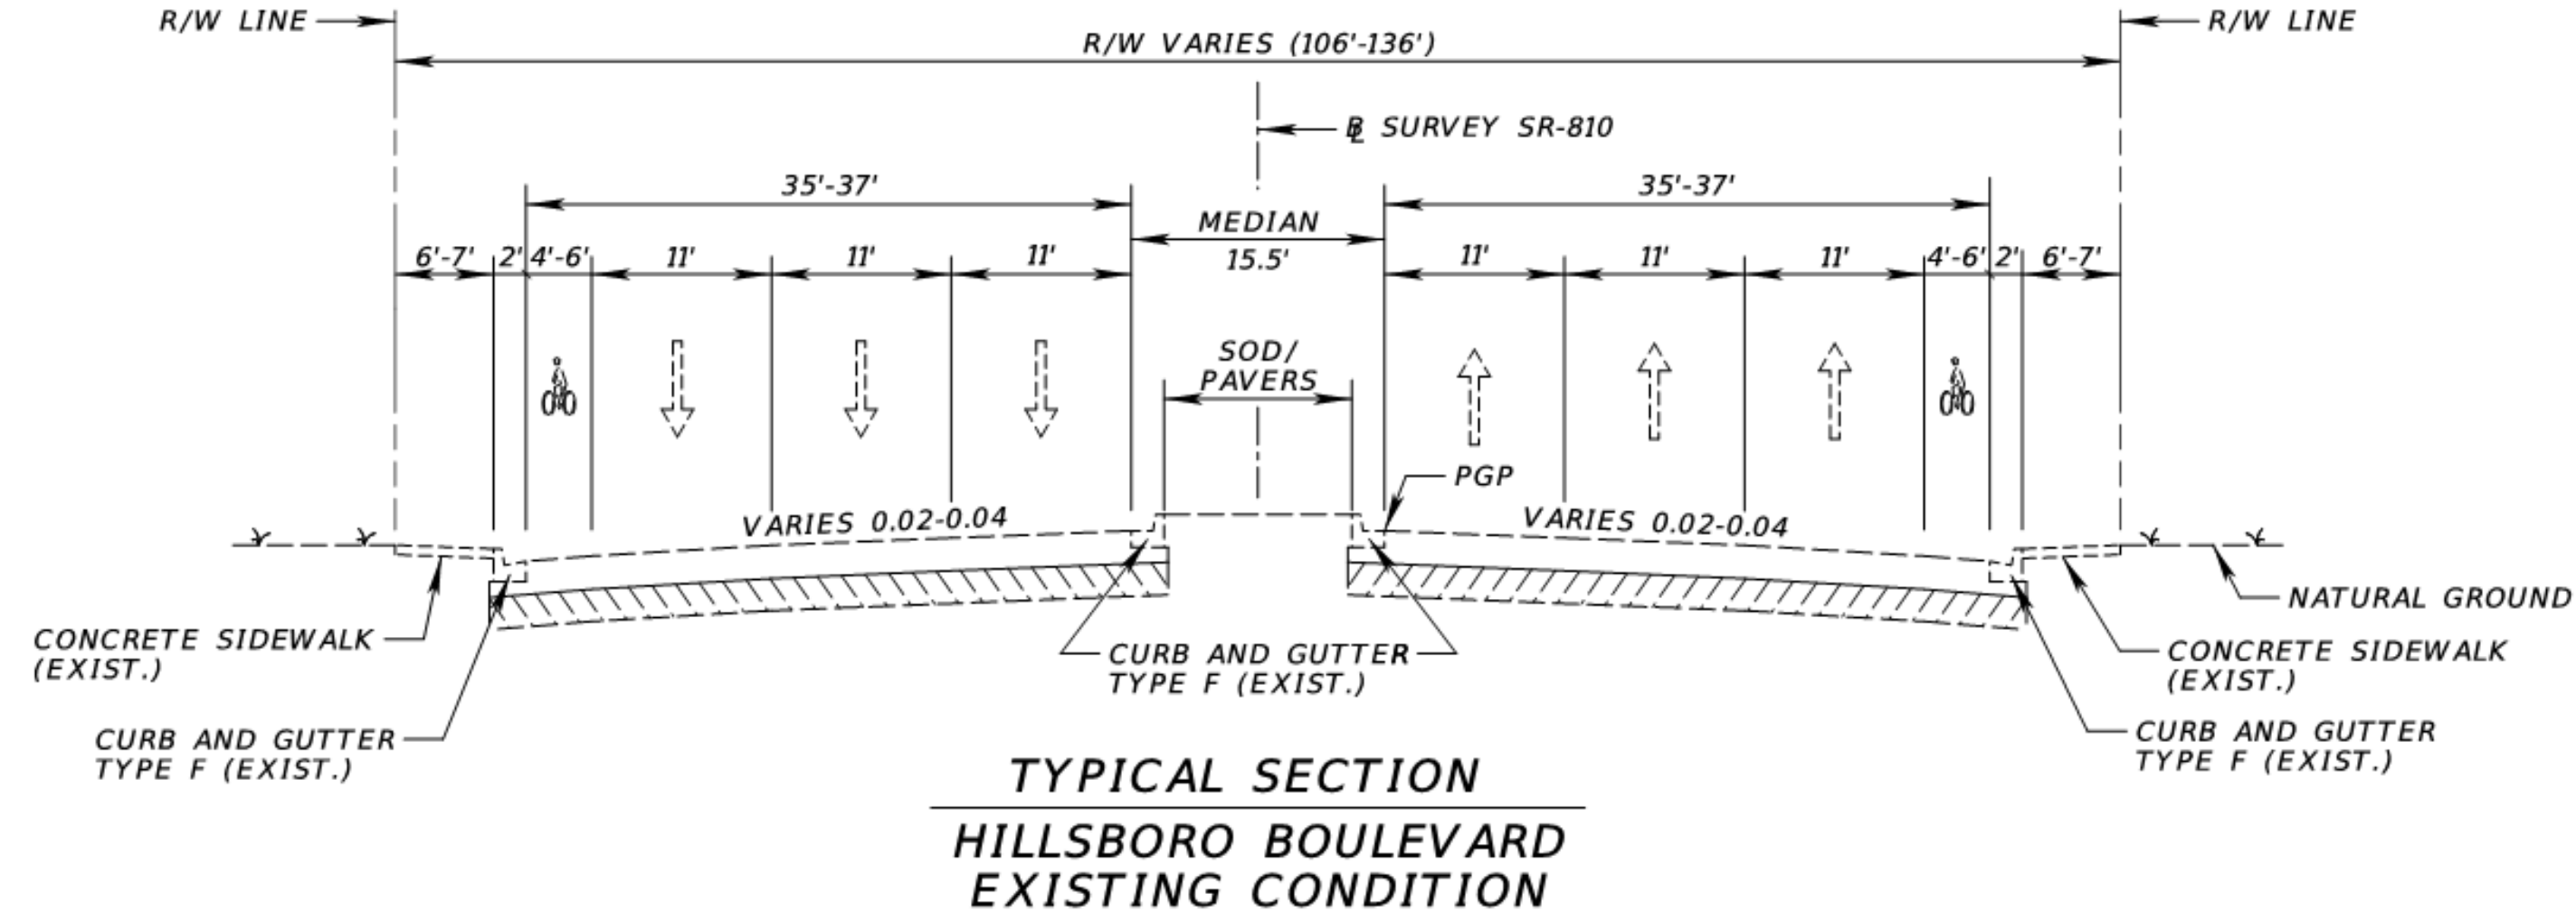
6: Existing Typical Section – Hillsboro Boulevard
